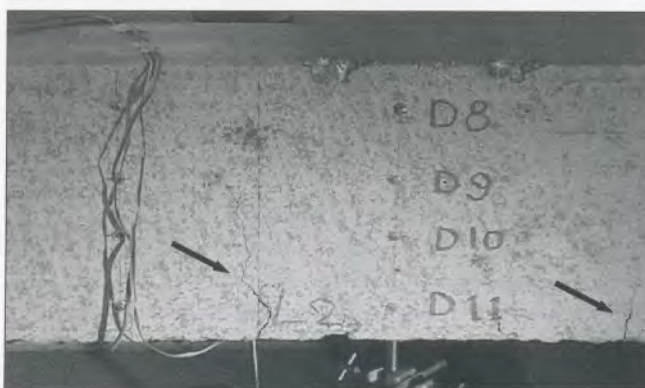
Front view detail of the riser at mid-span, showing cracks developed in the laboratory
